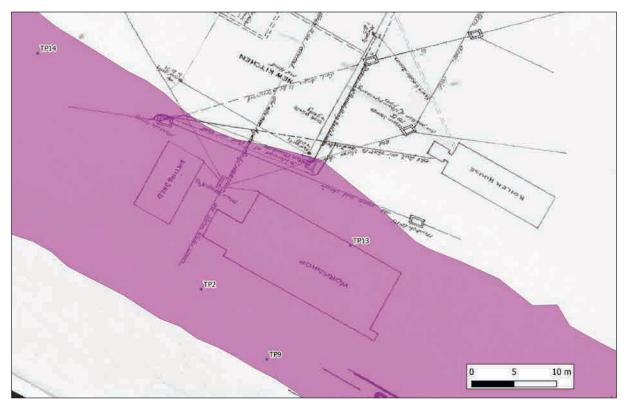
1903 plan of the alterations and additions to the hospital building showing 'workshop' and 'drying shed' within the area of proposed northern Gate 1 Road works (purple), and test pits dug during this assessment (Archives New Zealand ABZK 24411 W5433 PWD20686/1).
